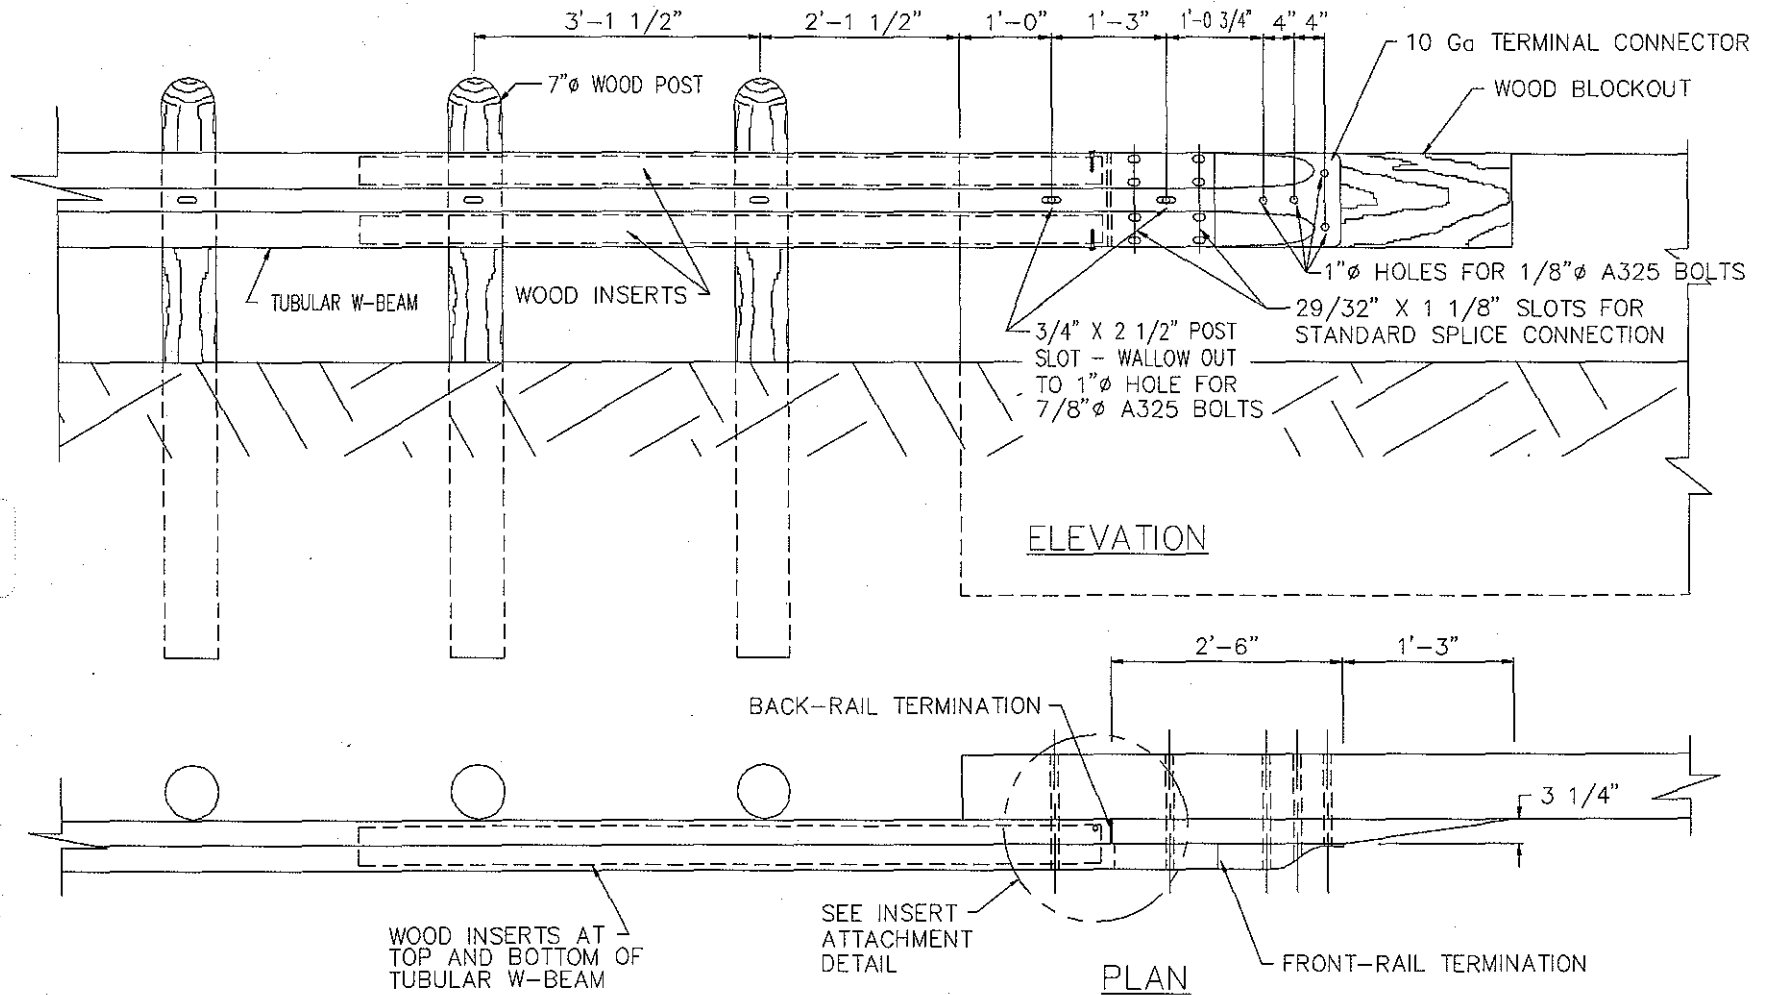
TUBULAR W-BEAM CONNECTION TO VERTICAL WALL FOR RETROFIT INSTALLATION
